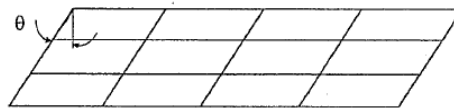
Plan View of Skewed Bridge with Example Bracing Layout
